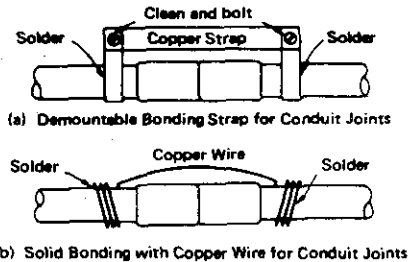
Figure B – Two Recommended Methods For Electrical Bonding Across Poor Conductivity Conduit Joints
